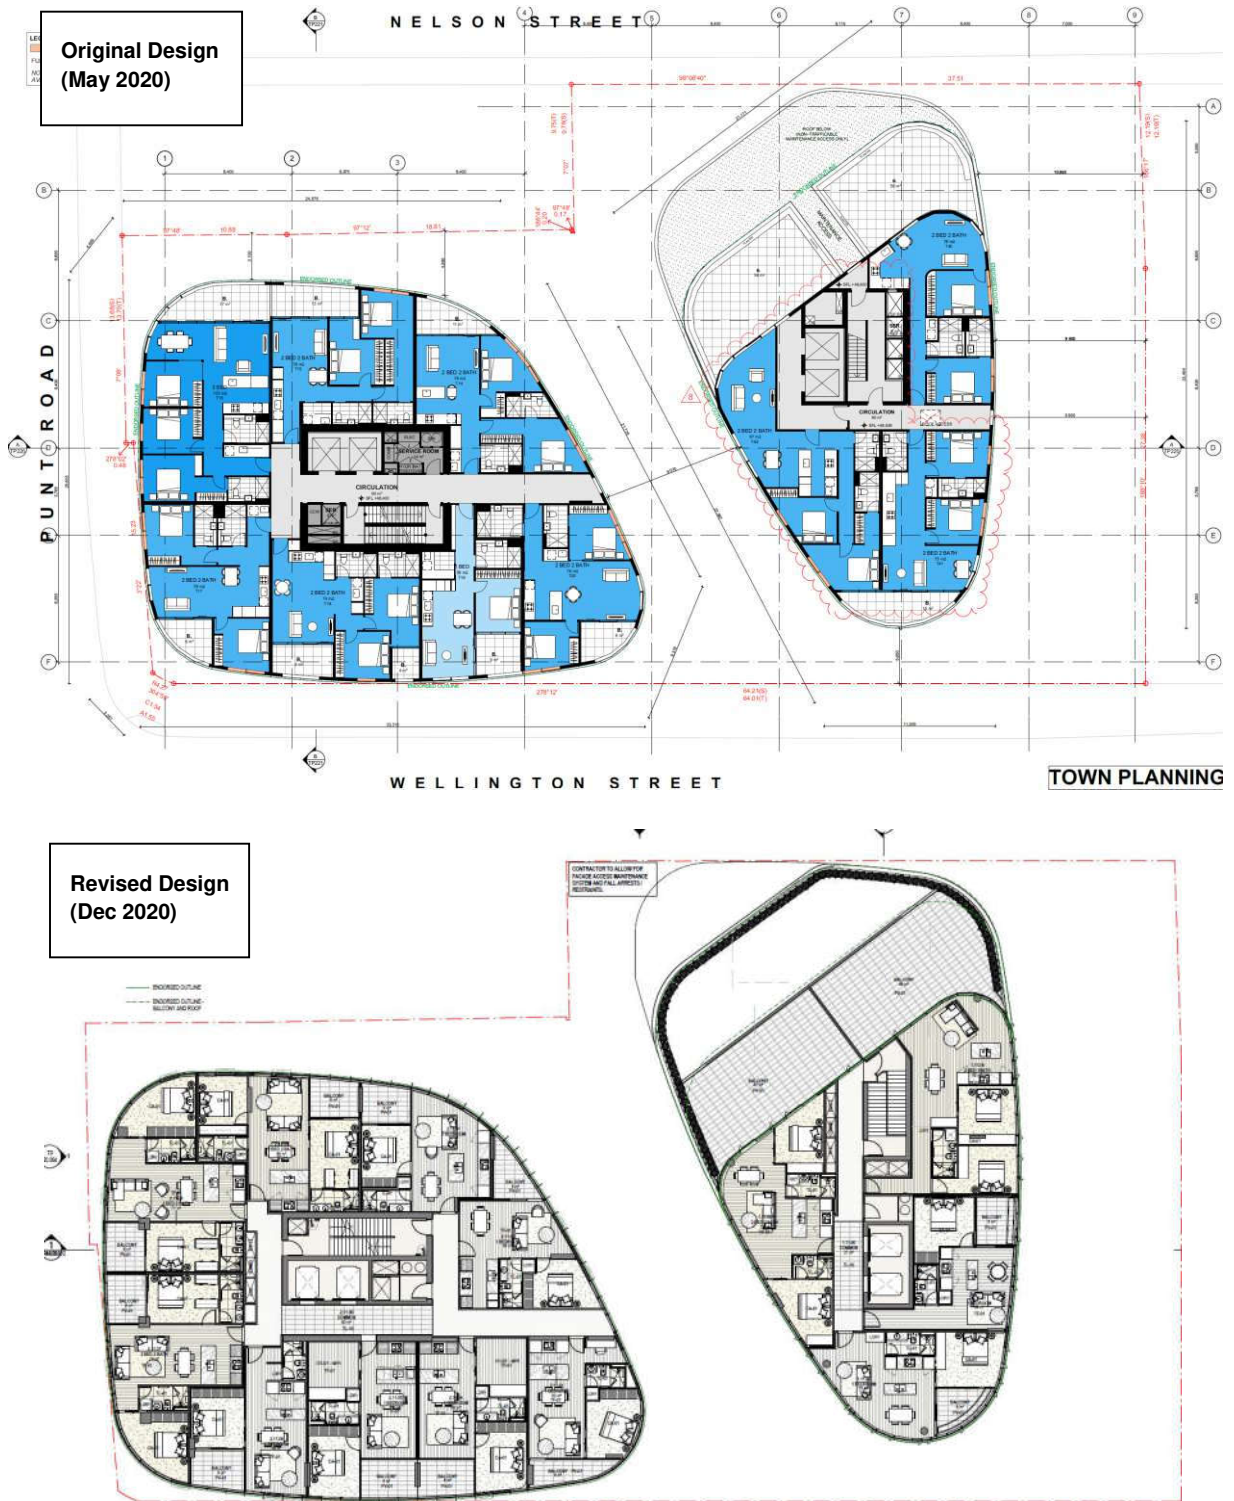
Level 11 plans for the development at One Wellington, St Kilda – comparison between revised design and original design tested in the wind tunnel
